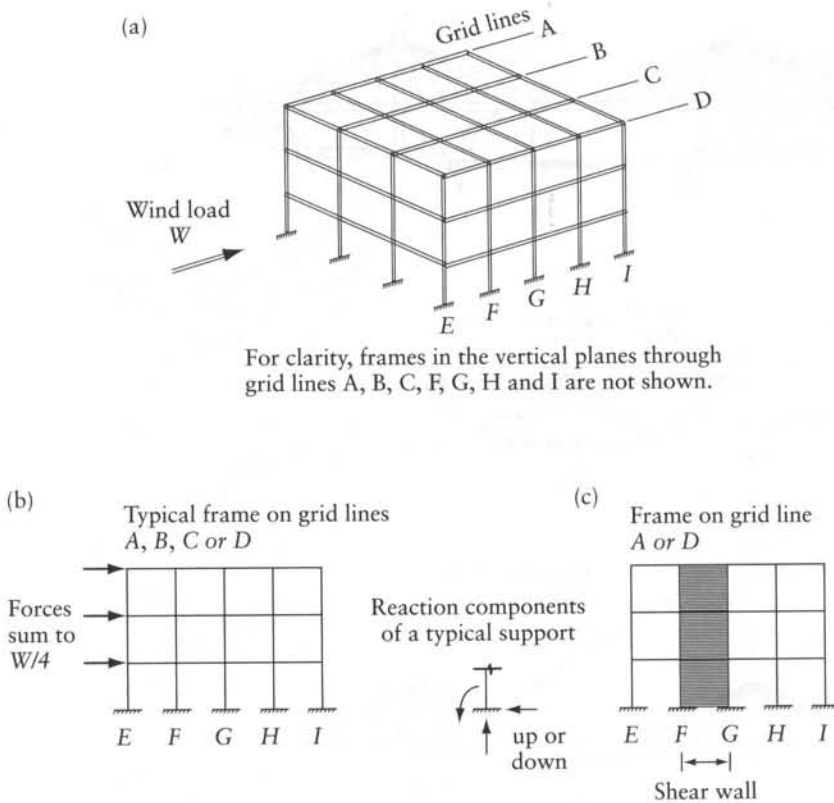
Idealization of a building for analysis of the effects of wind load. (a) Space frame. (b) Plane frame idealization. (c) Plane frame containing shear wall.
